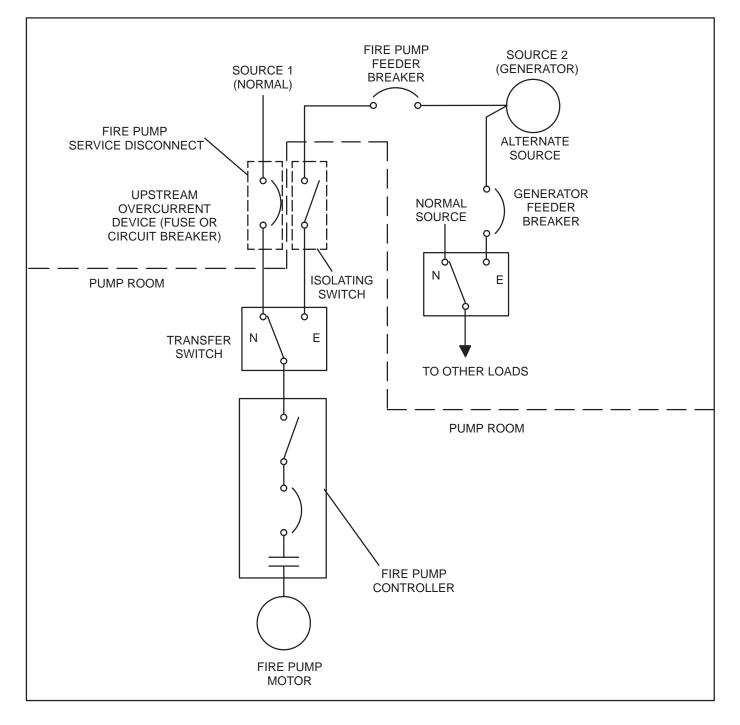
TYPICAL FIRE PUMP CONTROLLER AND TRANSFER SWITCH ARRANGEMENT
